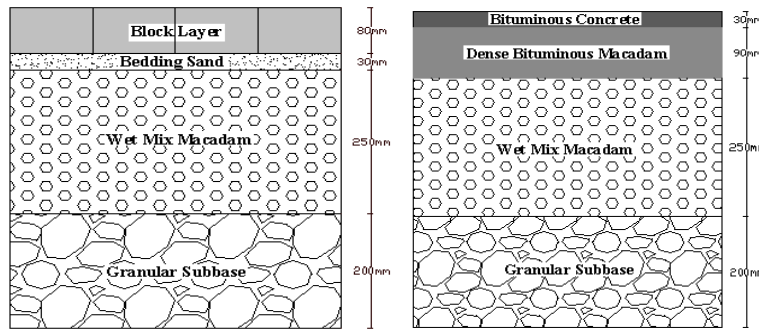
Designed interlocking concrete block pavement Fig. 2. Designed flexible pavement
